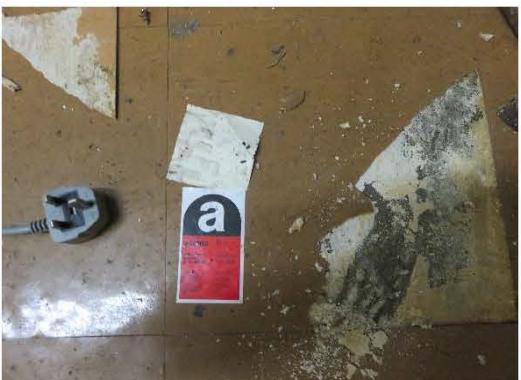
Vinyl floor tile with mastic (ACM) in Room G10 on the G/F of Training Centre
